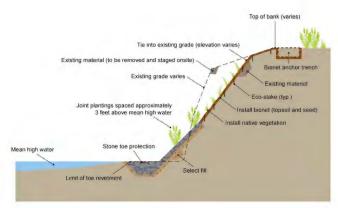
Typical detail, joint planted revetment. Also illustrating potential need to modify adjacent bank
